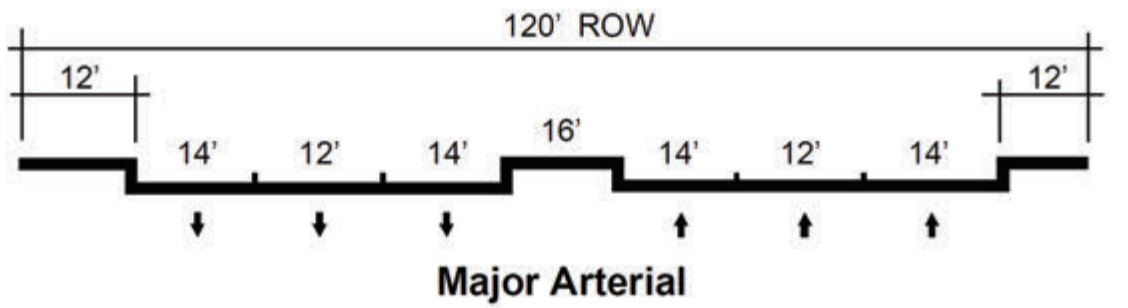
GENERAL PLAN TYPICAL CROSS SECTIONS
